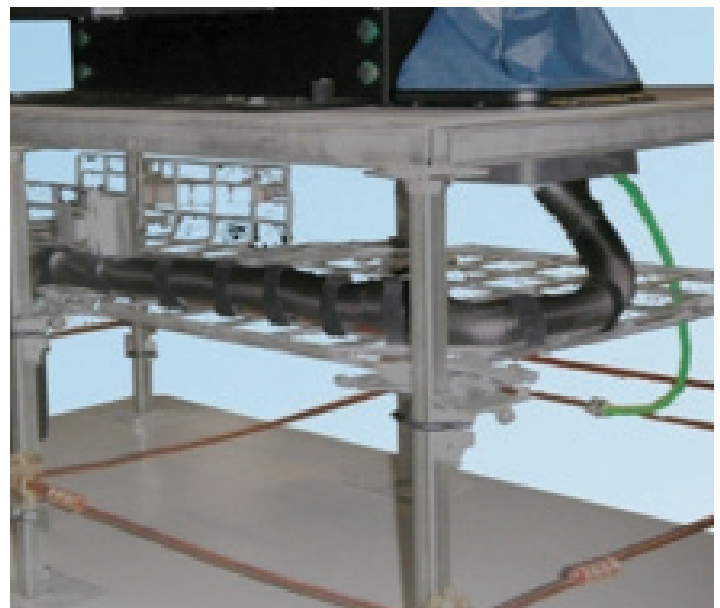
Example installation of GridRunner™ under floor wire basket pathway with 2-post rack and vertical cable manager. Cable is 12-fiber jacketed ribbon interconnect inside split loom tubing. Note PANDUIT® Cool Boot™ Raised Floor Air Sealing Grommet (dark blue) installed to minimize air leakage through opening in raised floor tile.
